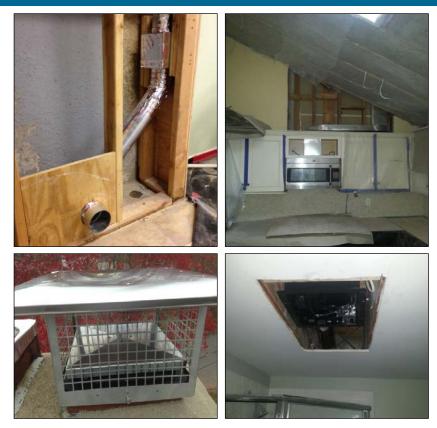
Additional improvements: a secondary lint trap was installed on the clothes dryer (upper left); the microwave over the kitchen range was exhausted to outdoors (upper right); an exhaust fan was added to the first-floor bathroom that had no fan or window previously (lower right); a lock-top chimney damper was installed on the wood-burning fireplace (lower left).
